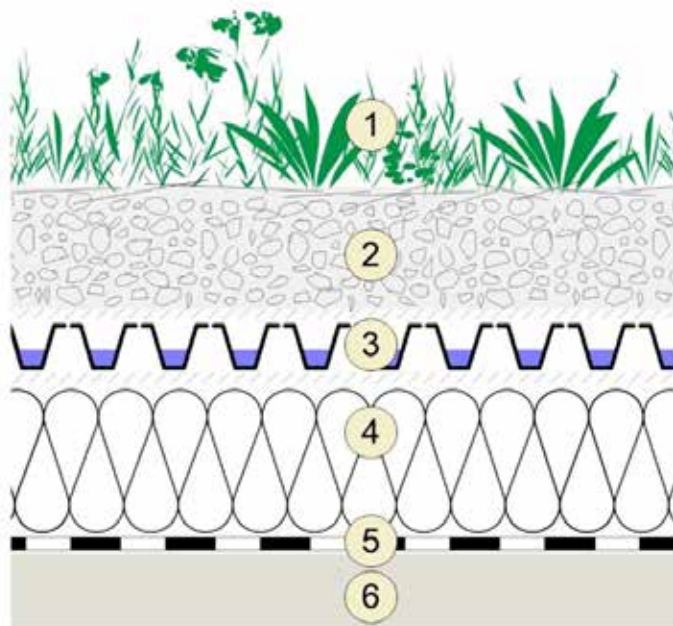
Construction layers of a green roof: 1 Vegetation 2 Vegetation support/substrate layer 3 Filter- and Drainage layer 4 Insulation 5 Sealing 6 Sub construction
